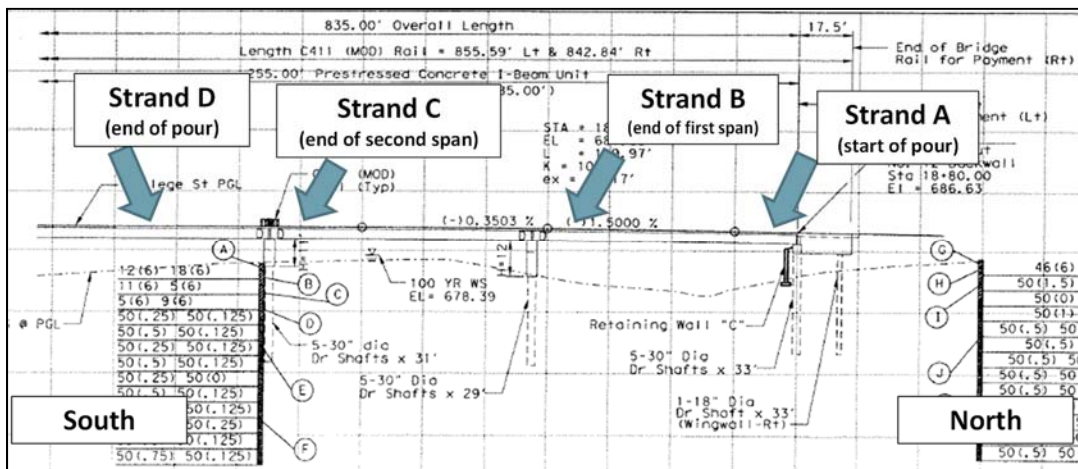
iButton strand layout for Georgetown bridge deck winter pour.
